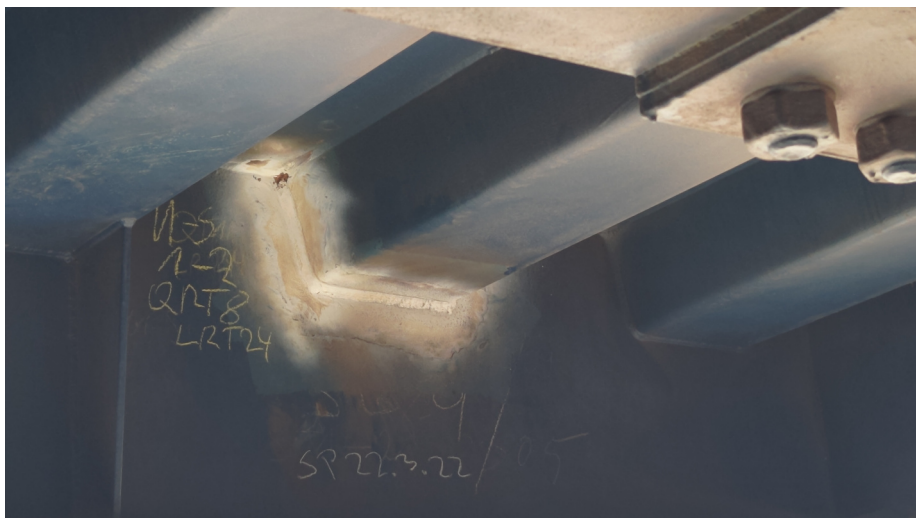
Welding details at the underside of the orthotropic deck that show fatigue damage at the weld toe
